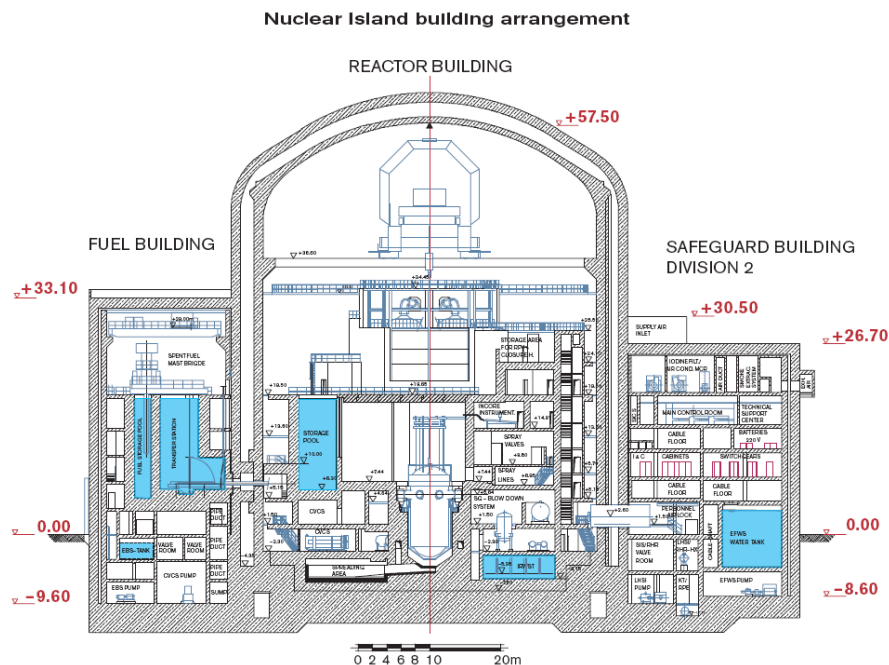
Building arrangement of EPR (Areva- EPR 2005).
